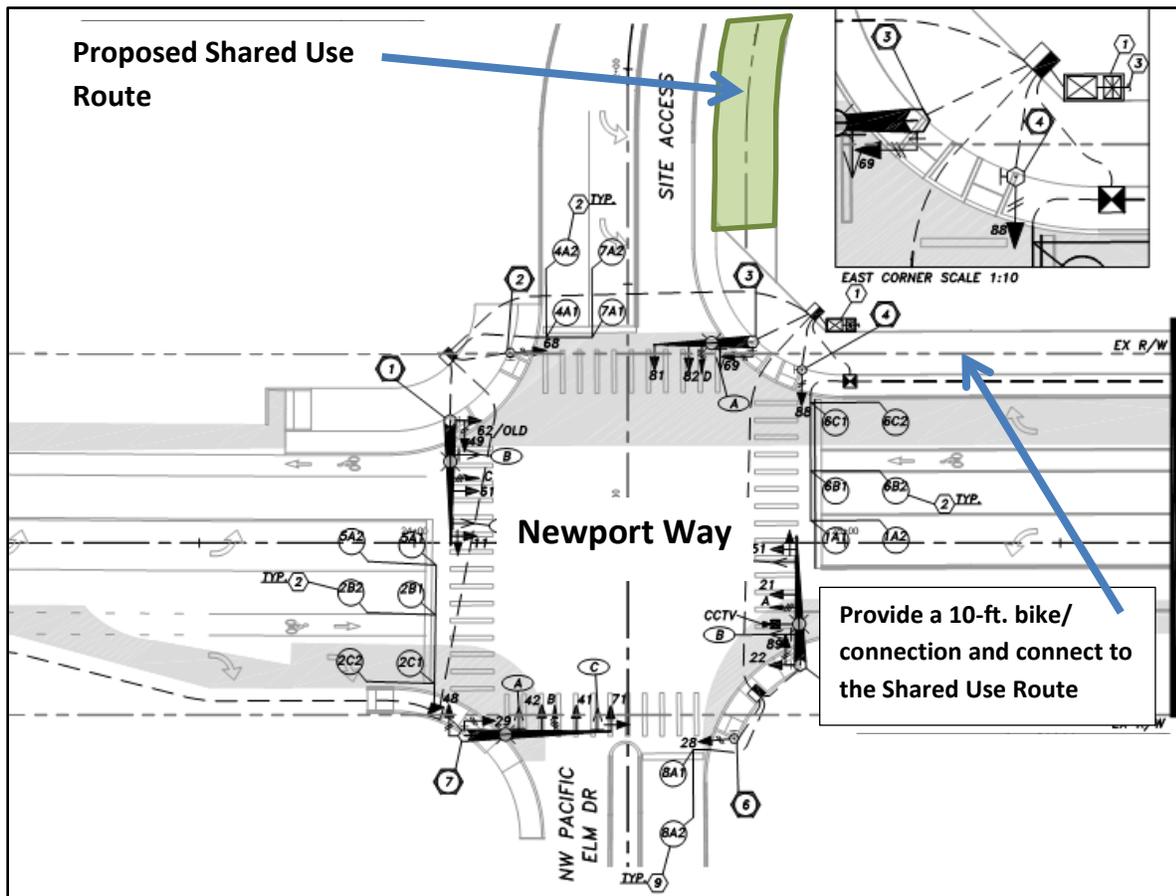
A 10-foot bike/pedestrian connection should be provided on Newport Way
